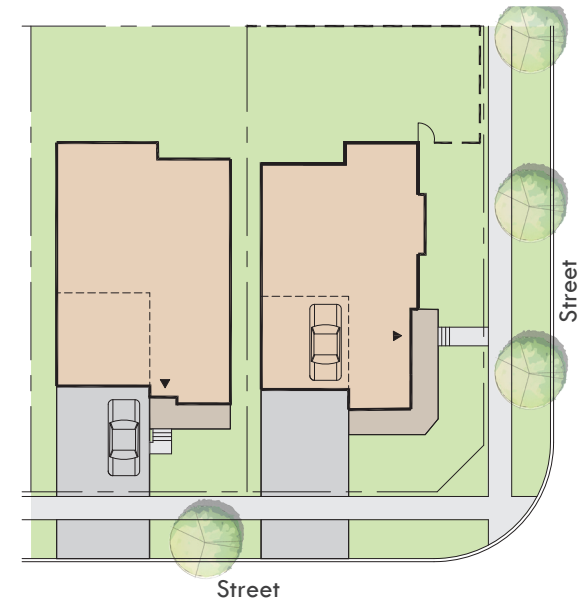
Conceptual Siting of Single Detached Dwellings
